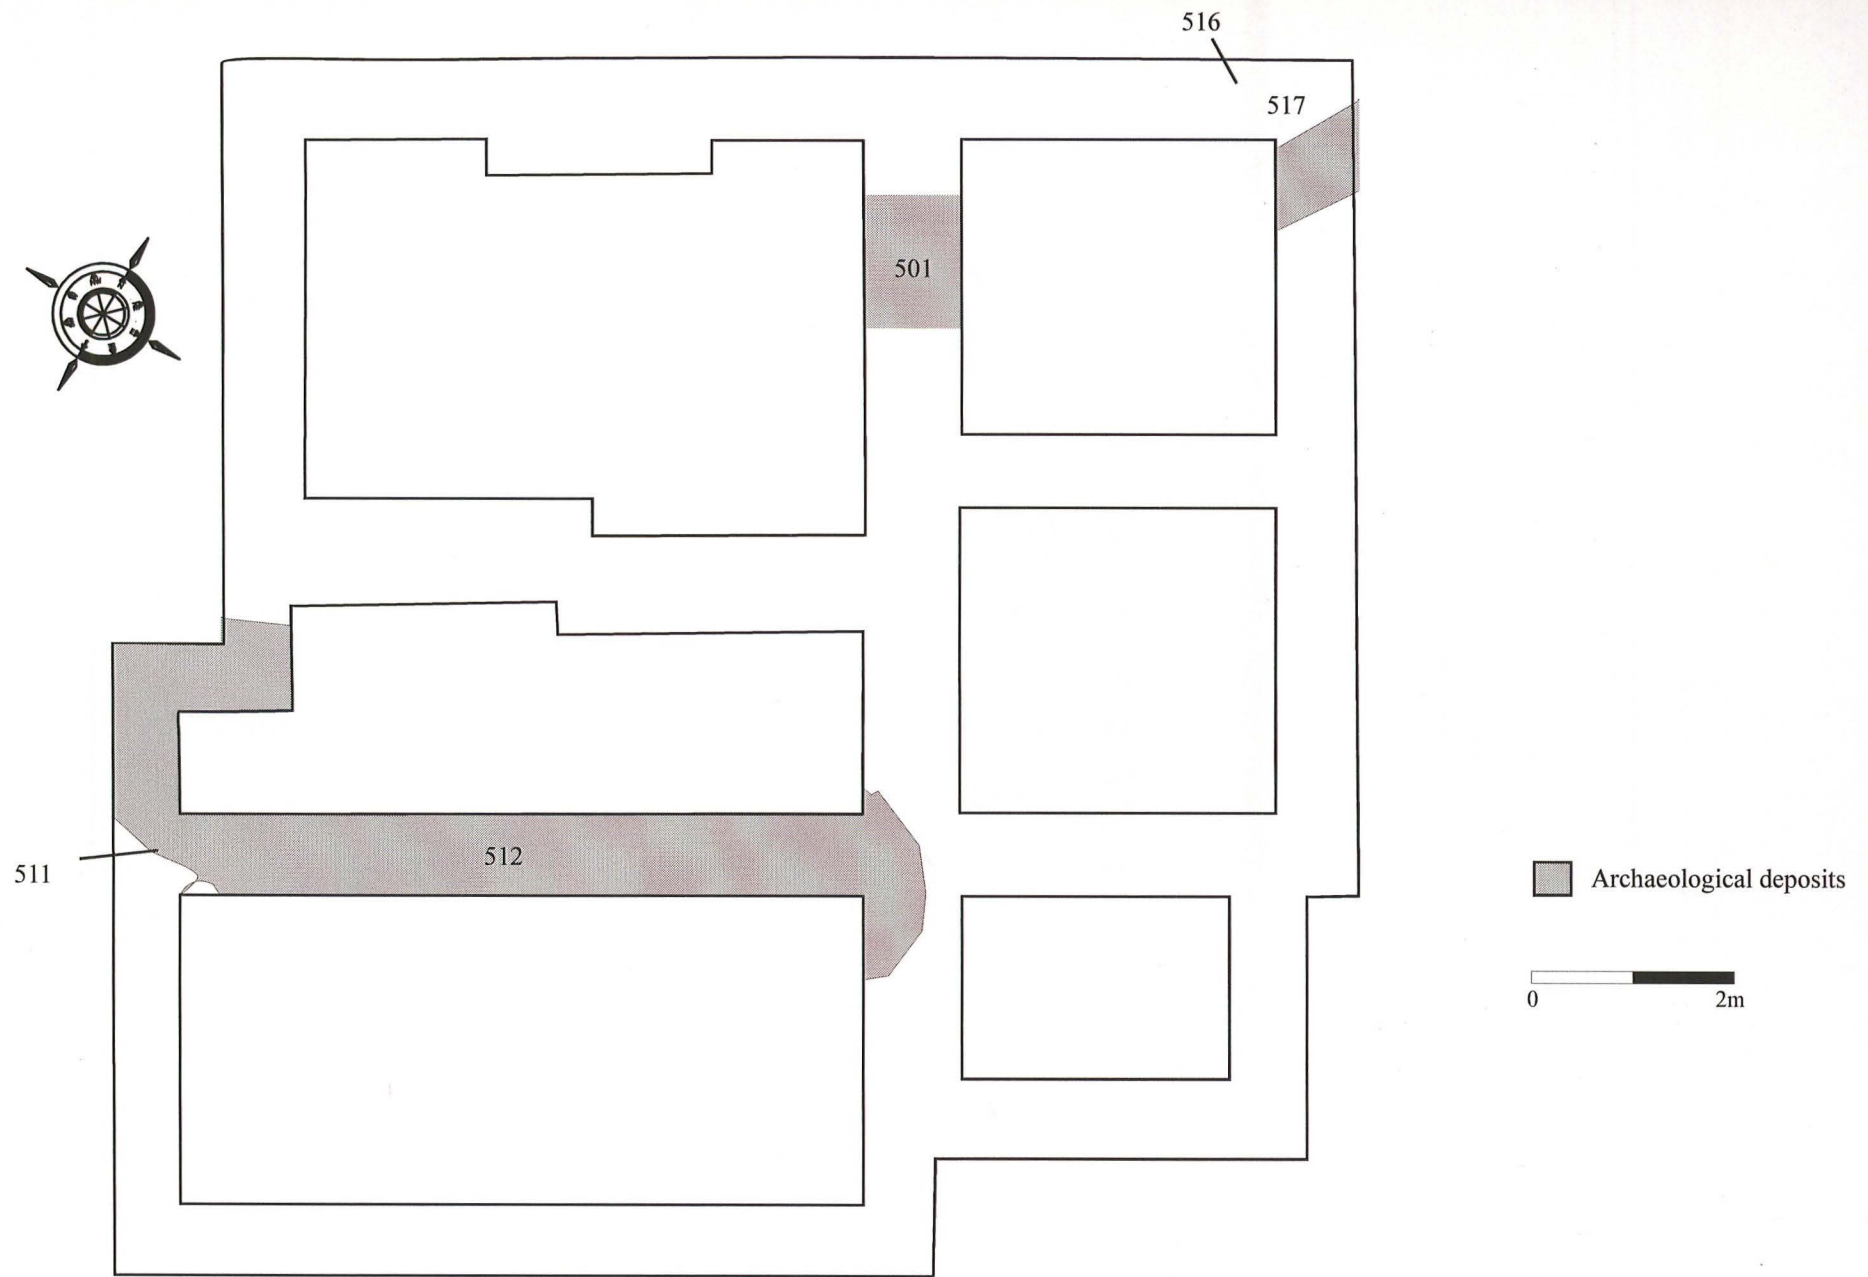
Plan of the foundation trenches, Plot 13, showing the position of identified features.
